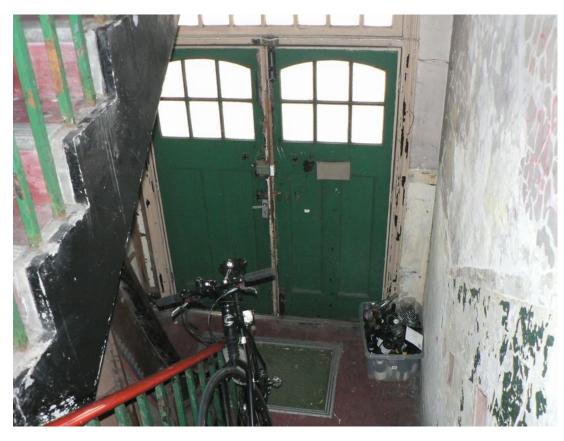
54-64 Charterhouse Street, entrance door detail
